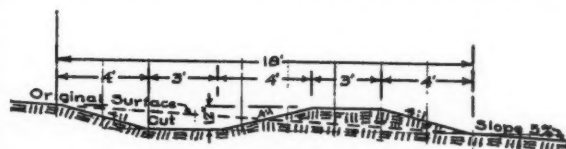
Cross-section of a terrace for moderate slopes, requiring 14 cubic yards of excavation per 100 lineal feet of terrace
